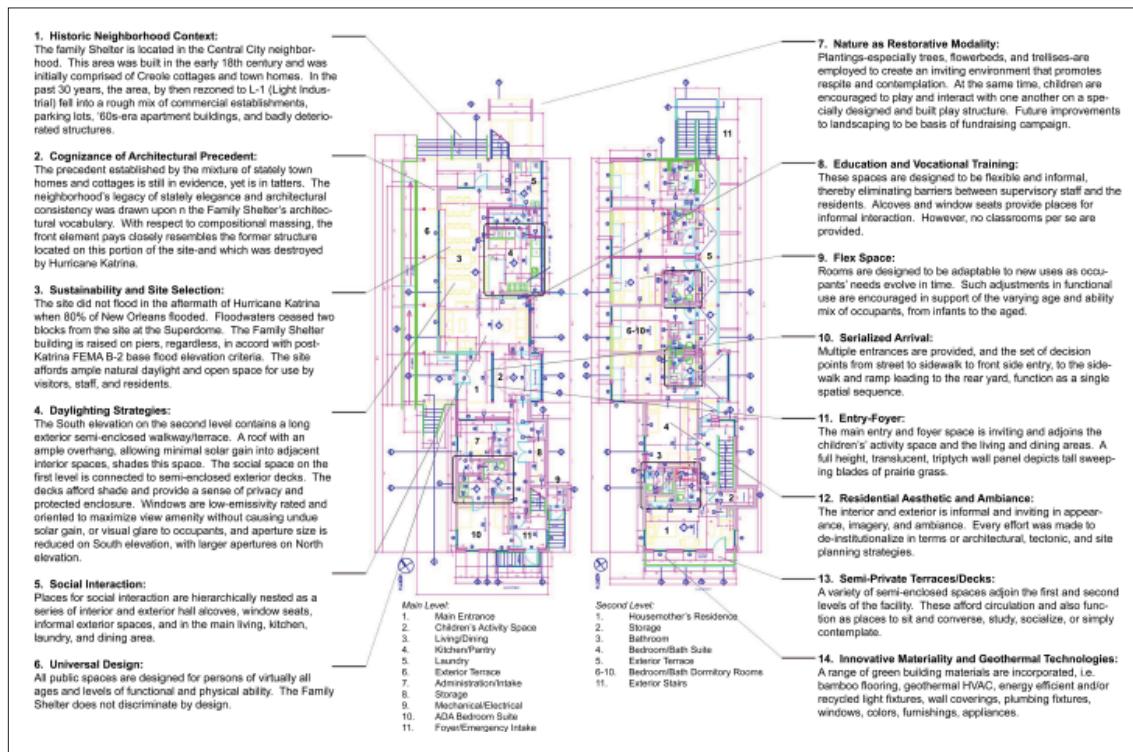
Key Site Planning and Design Concepts (Source: Authors).
